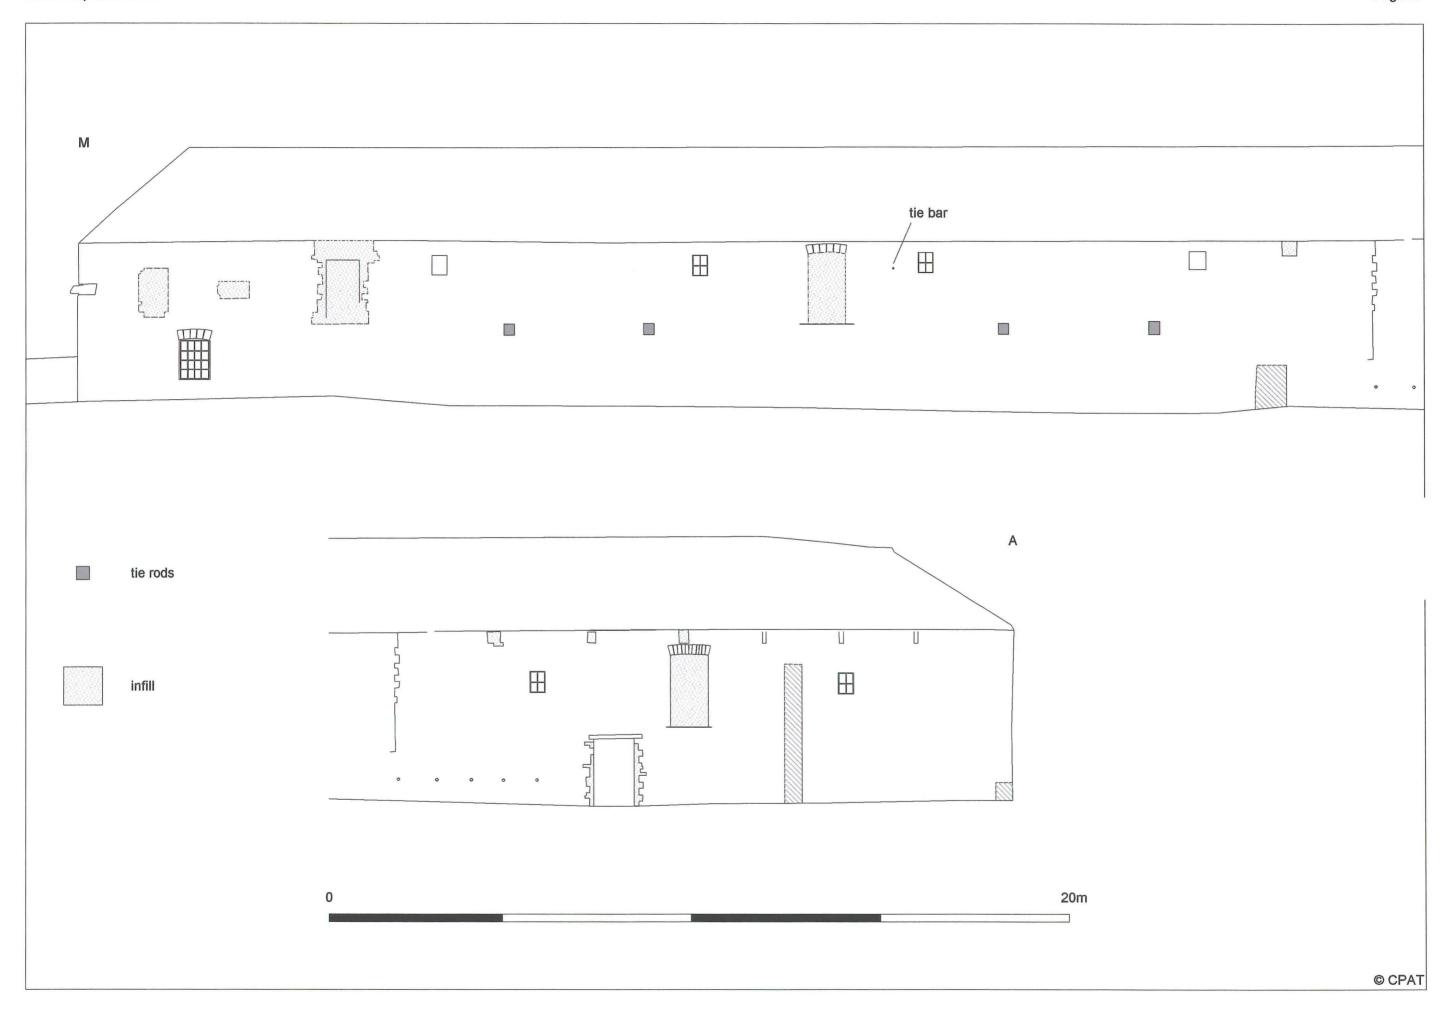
Roundhouse Farm Barns 2 and 3 west elevation (section M - A)
